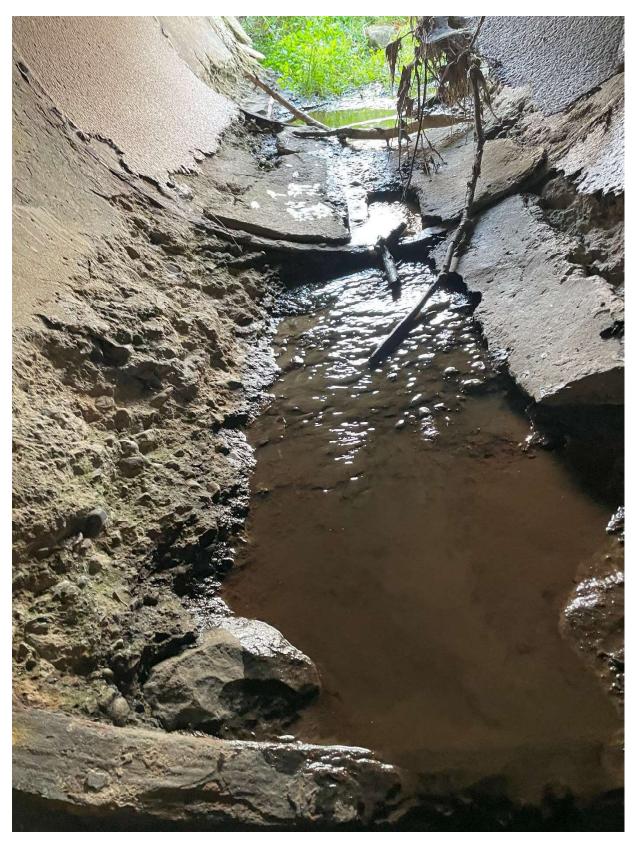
Garrett Road culvert looking west. The concrete on the bottom of the culvert is spalling.
